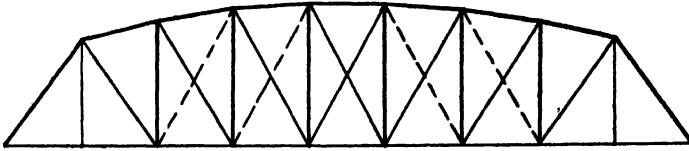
Pratt Truss with Polygonal Top Chord (Parker Truss).
